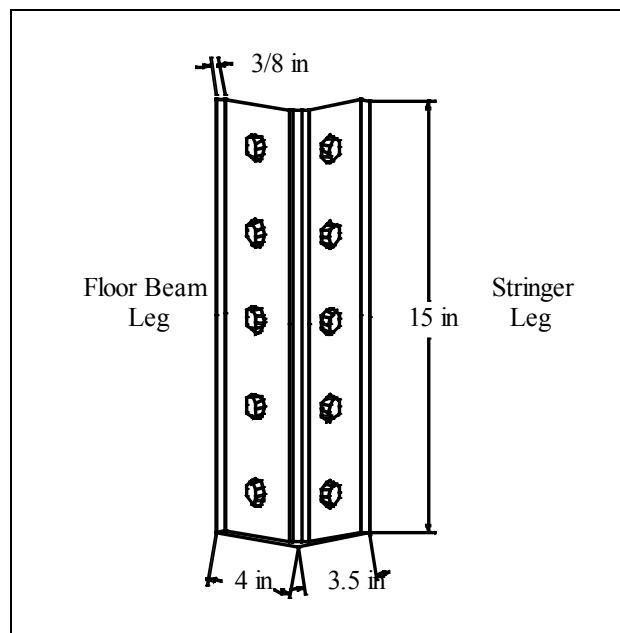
Winchester Bridge clip angle used in the stringer - to - floor beam assemblies
